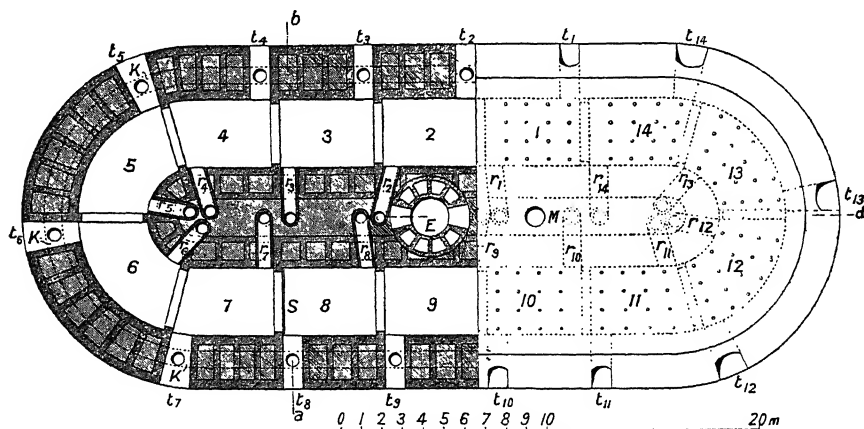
Plan of Hoffinan Continuous Kiln.
